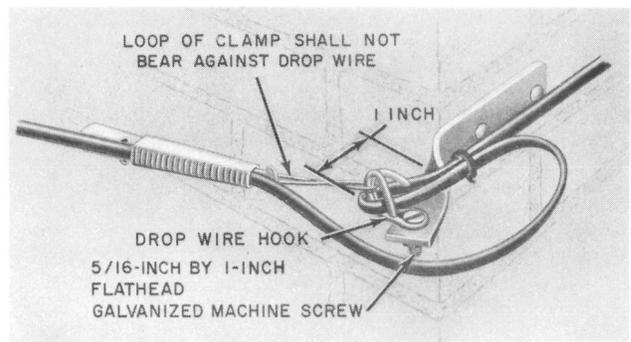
Corner Bracket Equipped With Drop Wire Hook
